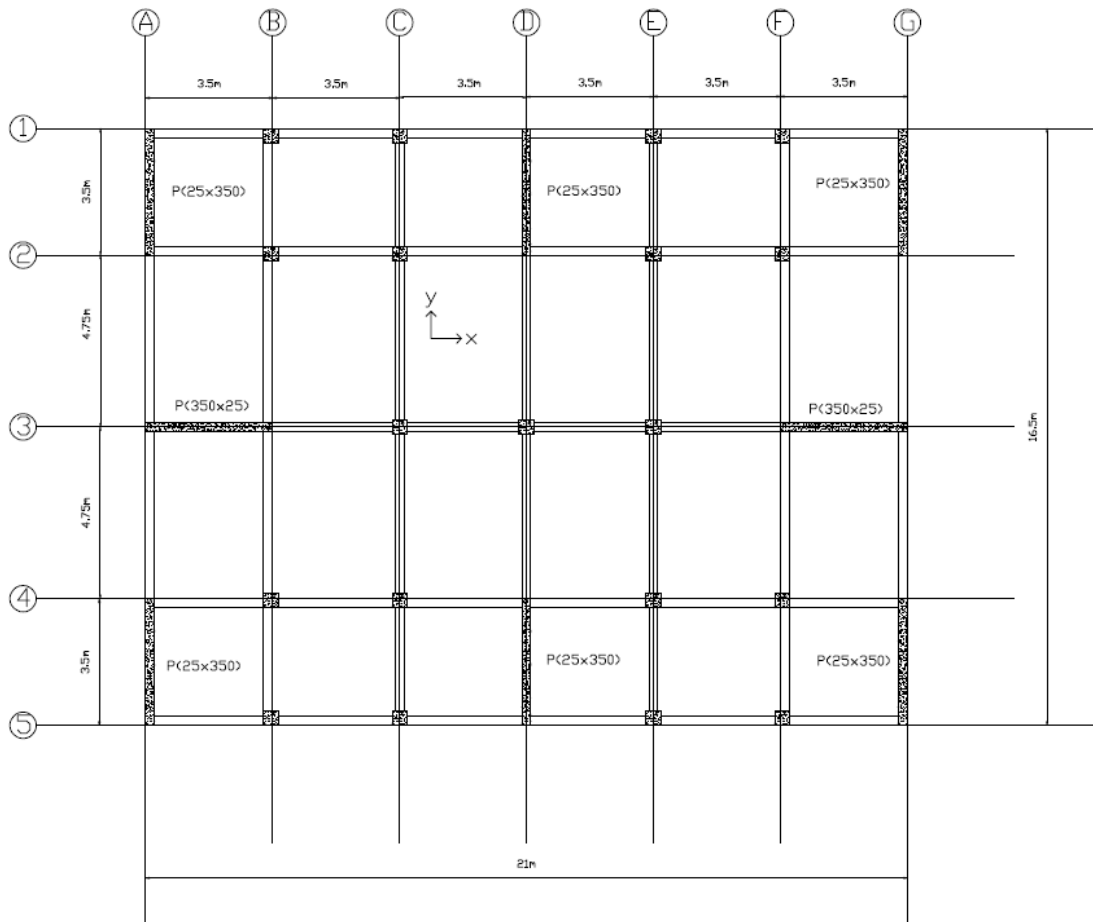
Plan of Model 4 with Wall Area to Floor Area Ratio of 0.5% in X-direction and 1.5% in Y-direction
